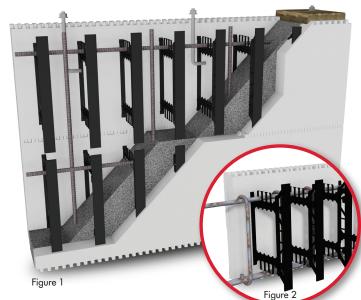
BuildBlock ICF wall section cutaway shows horizontal and vertical steel placement, alternating rebar placement to hold vertical rebar, J-bolts mounted in the concrete and a wooden top plate.
